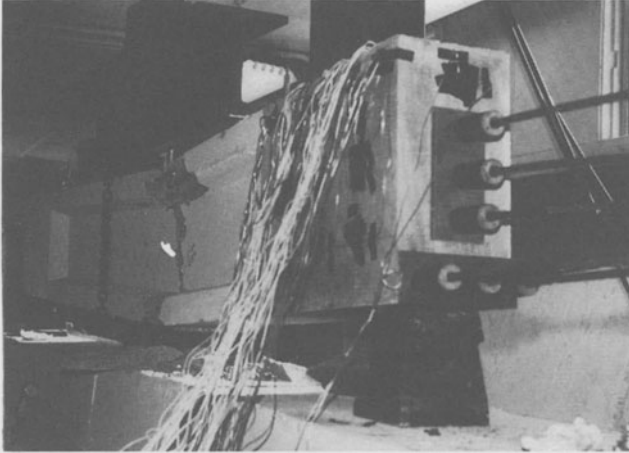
Typical Beam Test Set-Up Showing Anchorage Chucks
